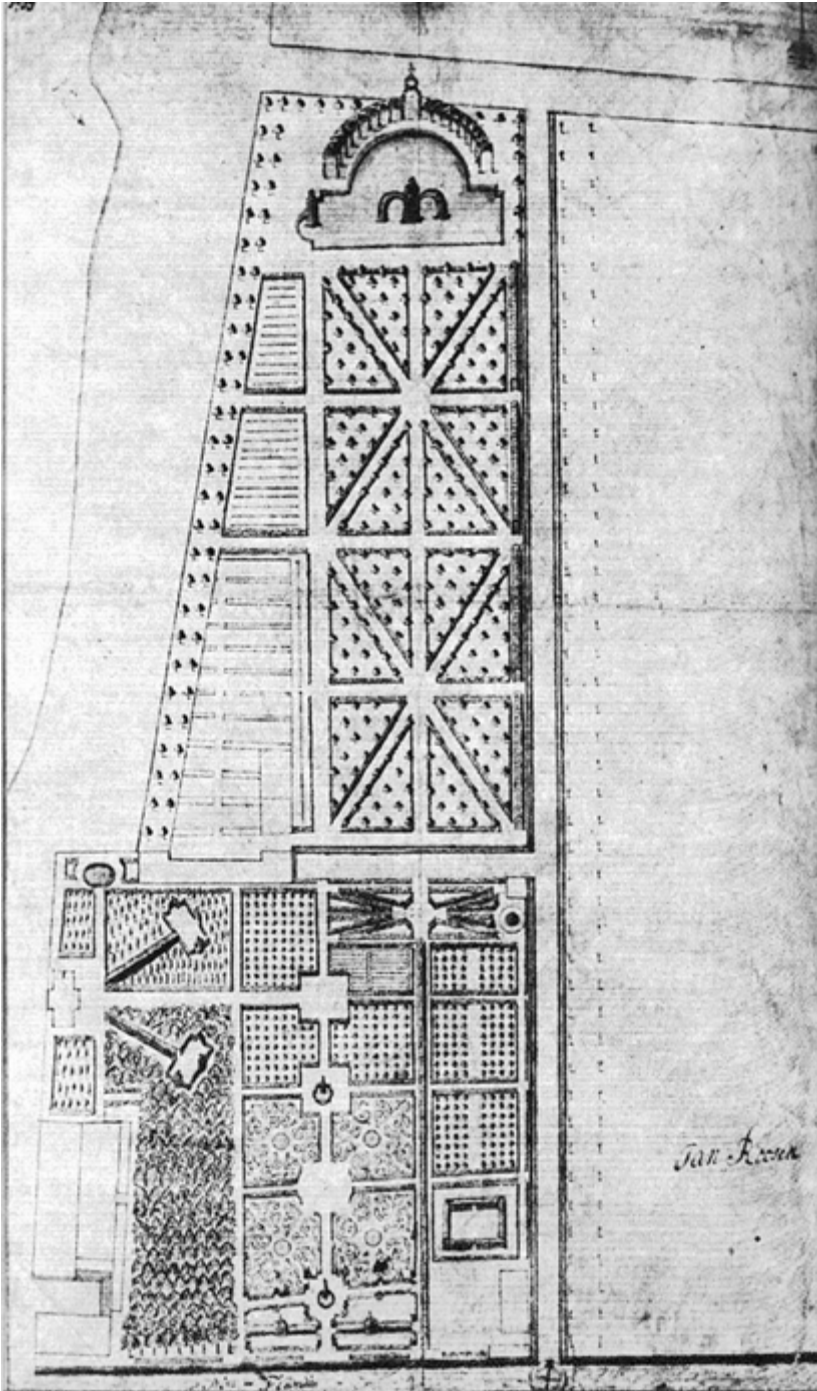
Fragment of the Summer Garden plan, by Jan Roosen (1714–16).
